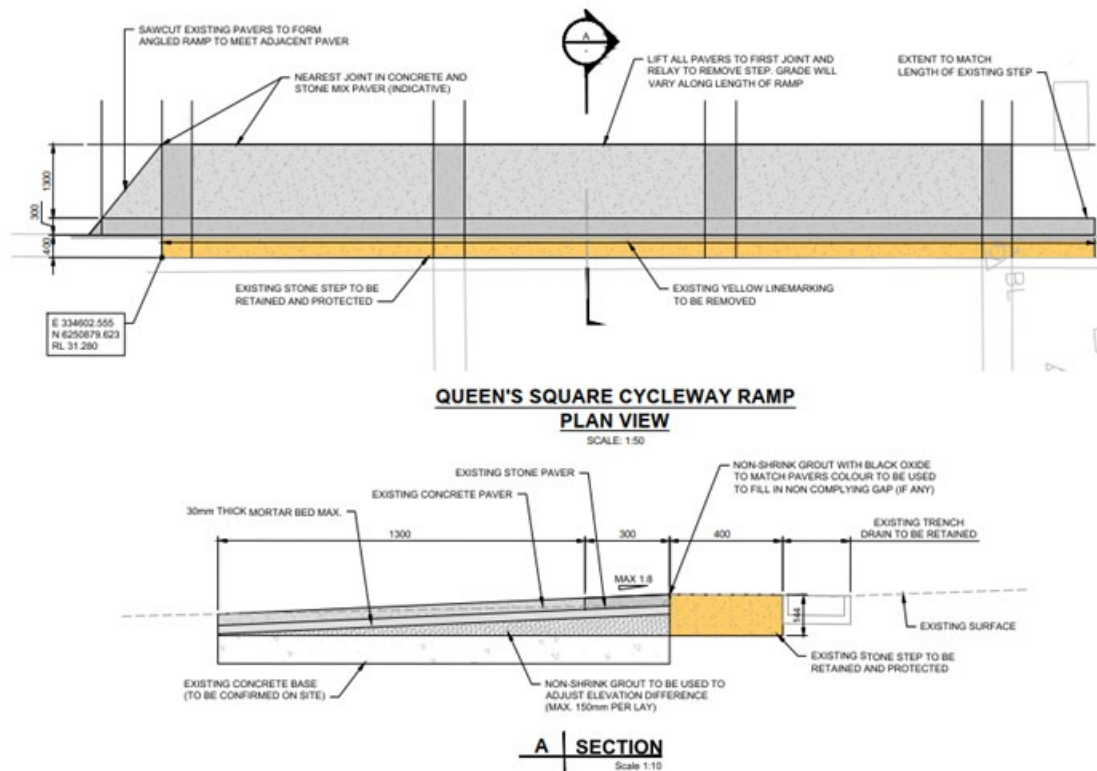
Schematic of proposed regrading of concrete step within Queen's Square to a cyclist ramp
